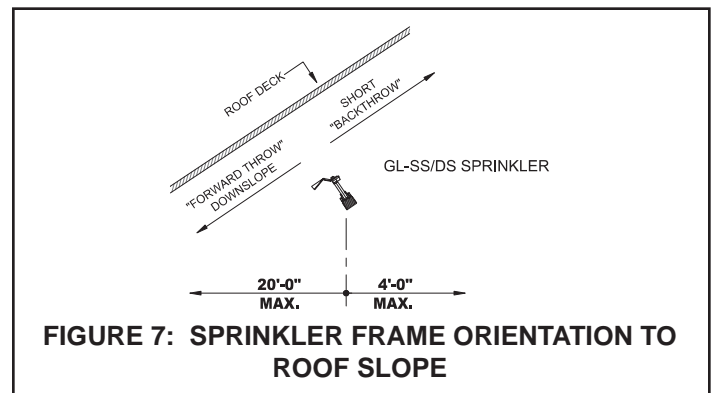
SPRINKLER FRAME ORIENTATION TO ROOF SLOPE
